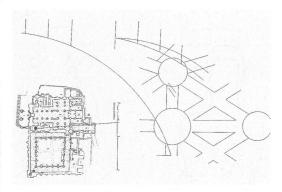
Drawing on stone of star vault; cathedral of Tui (drawing by José Manuel Yáñez Rodríguez)
